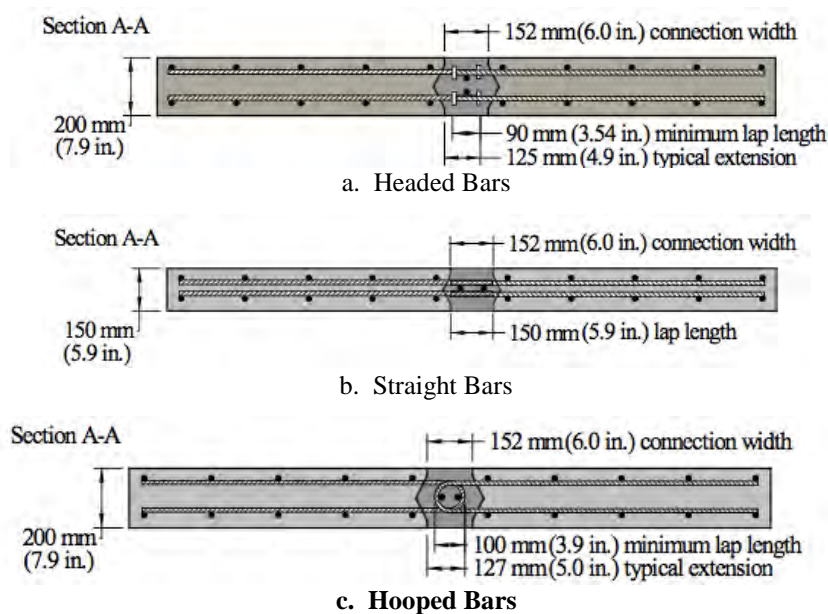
UHPC-Filled Deck Panel-to-Panel Longitudinal Joint Detailing (Graybeal, 2010)
